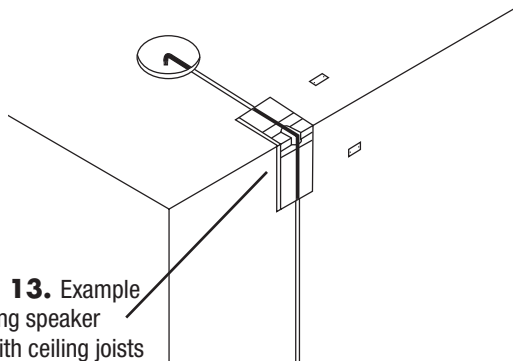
Example of a ceiling speaker cutout with ceiling joists notched for wire run.
